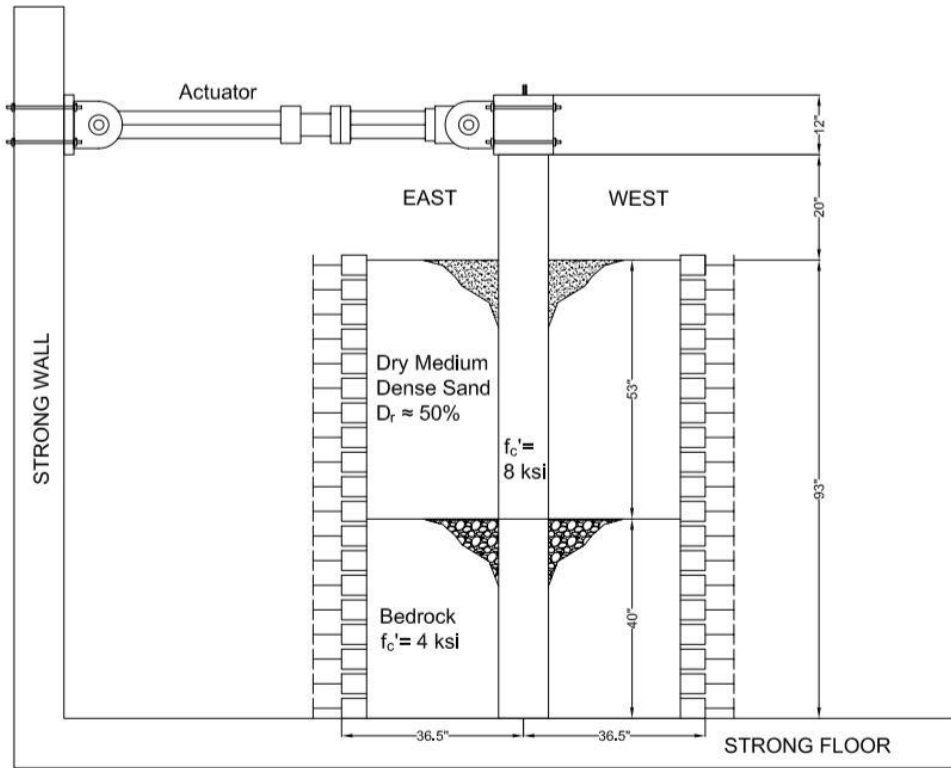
Experiment Setup for model scale test (Elevation View)
